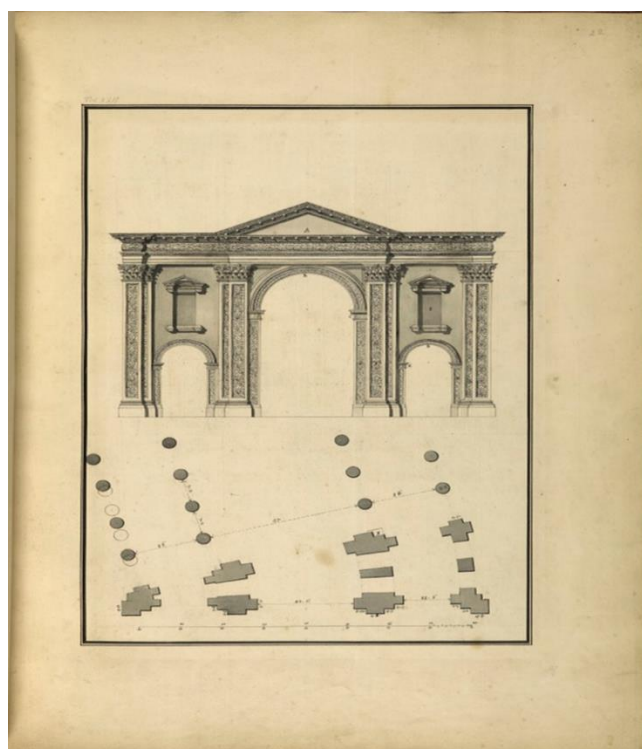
Reconstruction of the plan and facade of the east side of the Monumental Arch of Palmyra, Syria (Author: Borra, Giovanni Battista, London, 1753)
